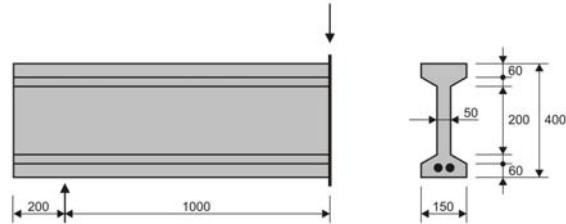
Shear tests on beams made of HPFRC [18, 19]
